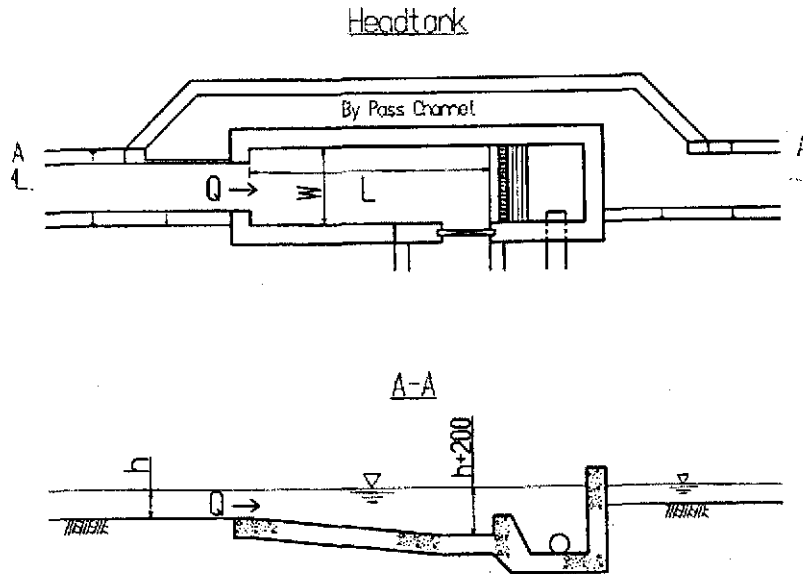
Plan and section of a head tank having a settling basin and bypass channel
